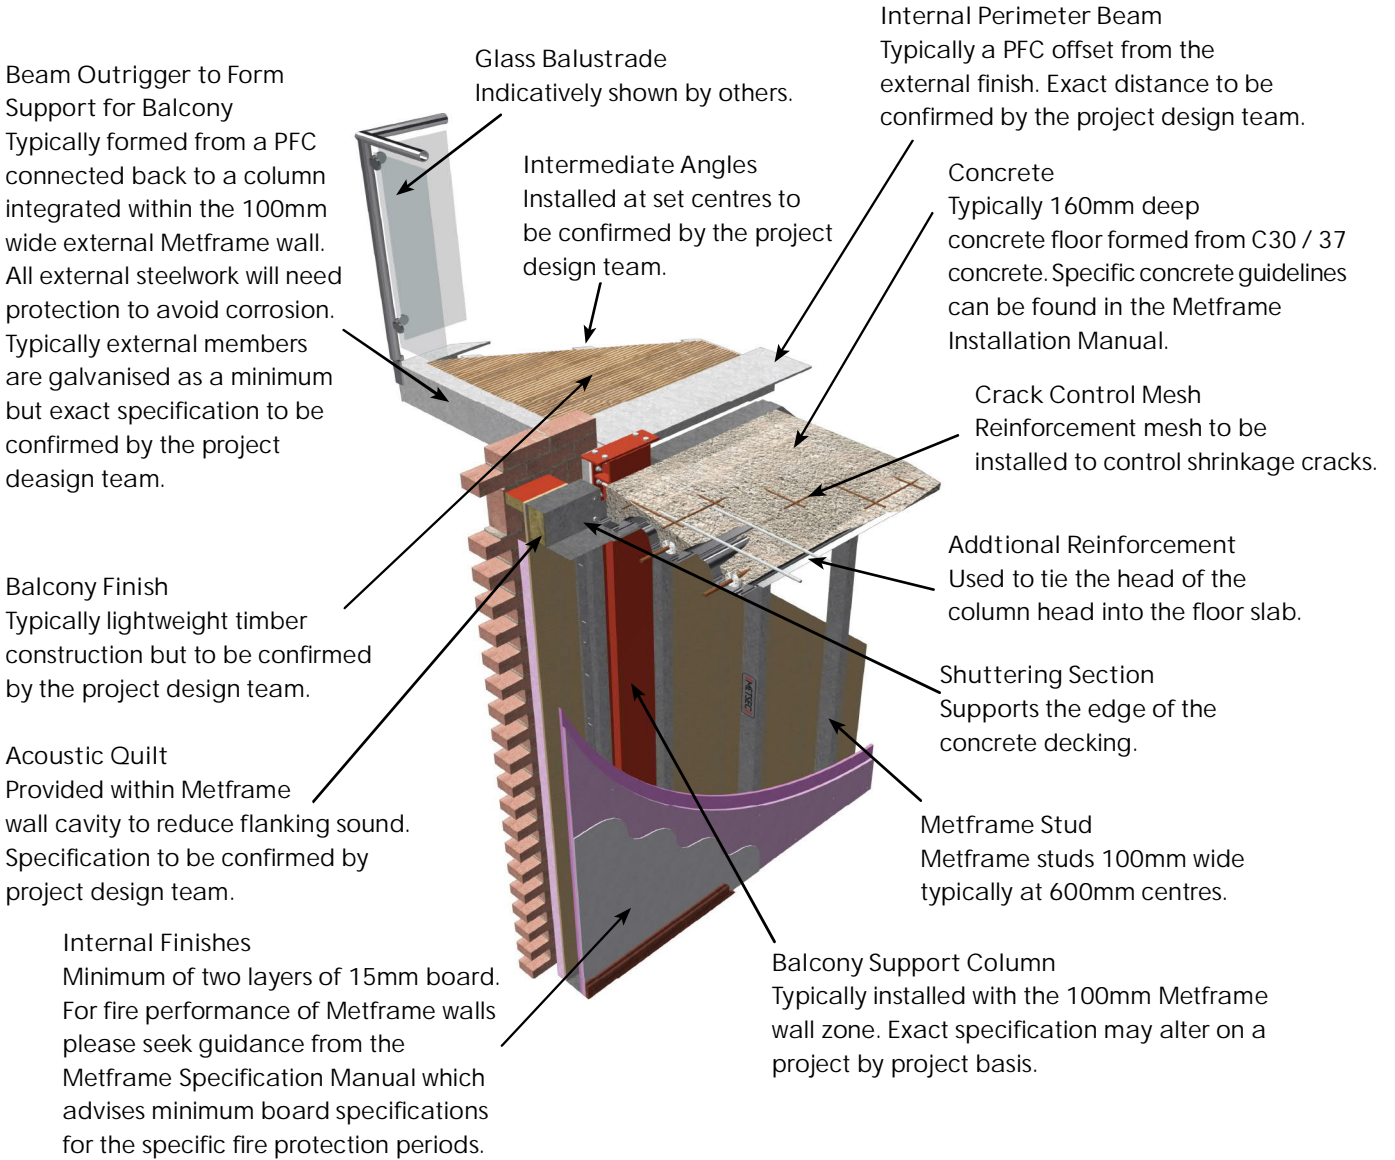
EXTERNAL WALL WITH CANTILEVER BALCONY VIEWED EXTERNALLY
